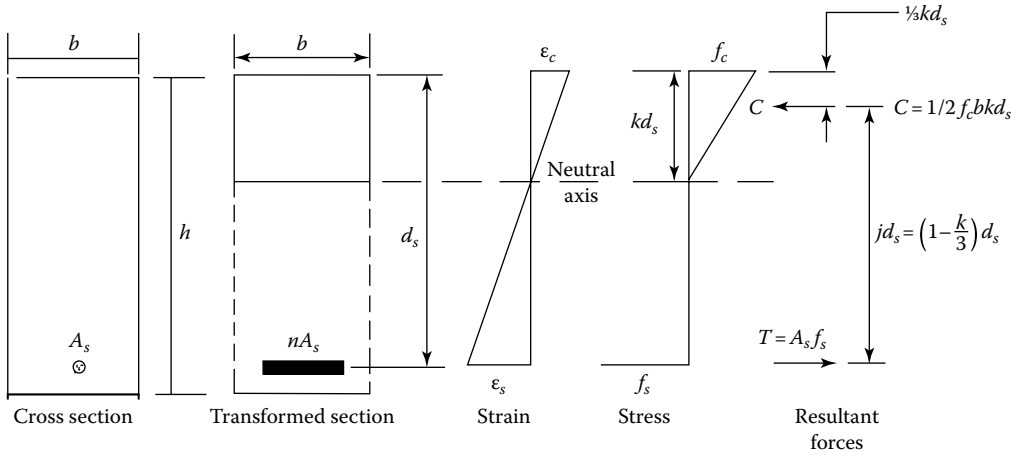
Service load analysis of a cracked reinforced concrete section.
